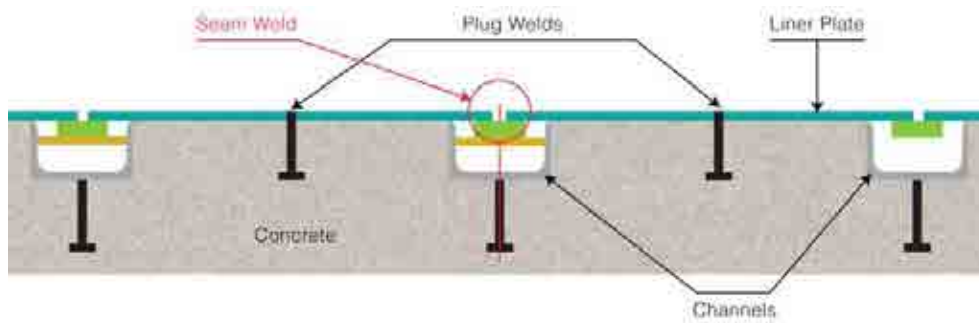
Typical concrete liner interface with plug welds (fusion bonds can also be used).
